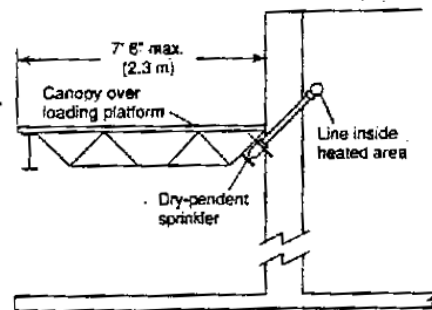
Dry-pendent sprinklers for protection of covered platforms, loading docks, and similar areas.
